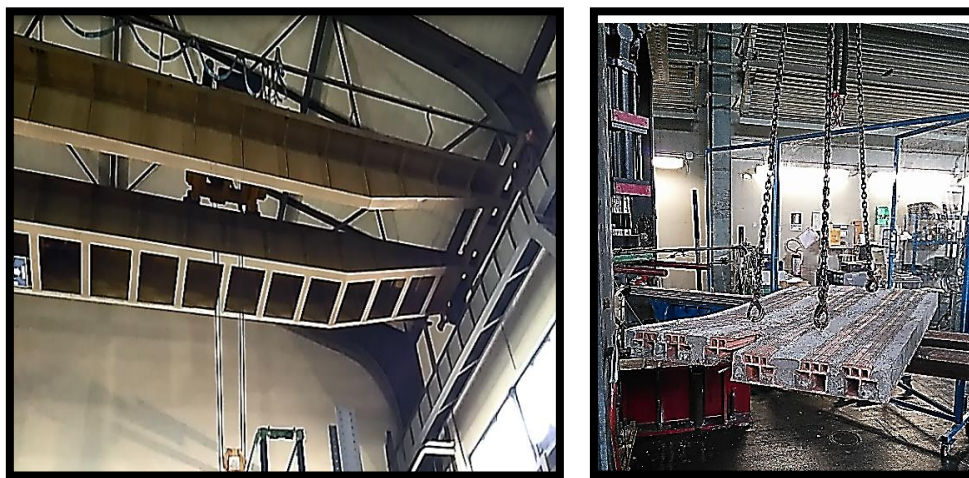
Crane and hooks to lift the slab. (Source: Laboratory image)
